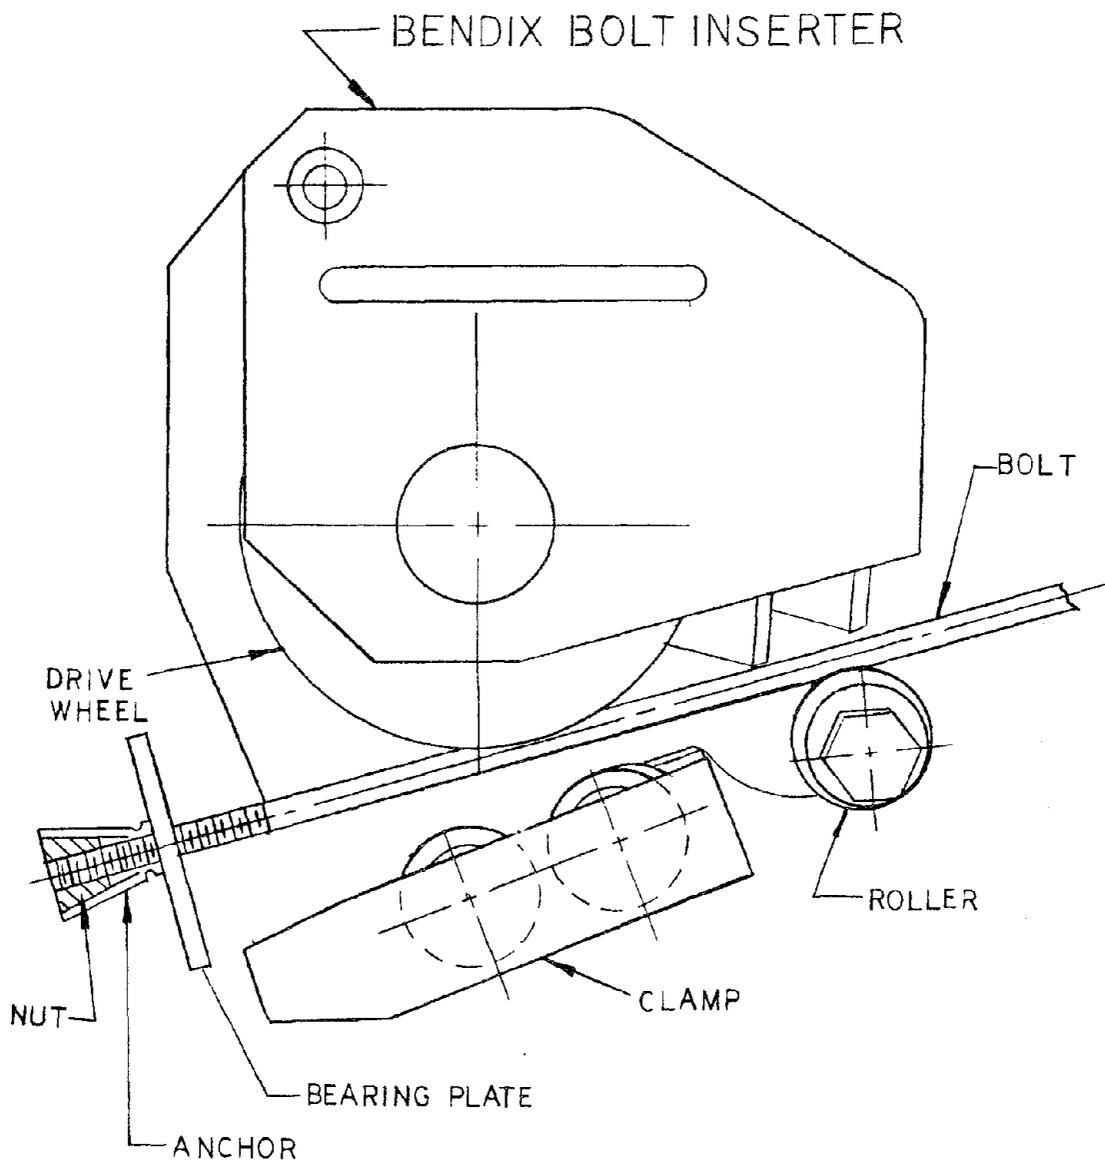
Bendix Bolt Inserter Loading Method No. 2
